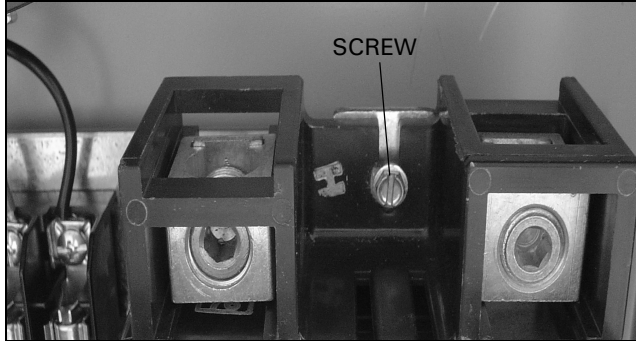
Location of the Top Service Entrance Breaker Mounting Screw.
